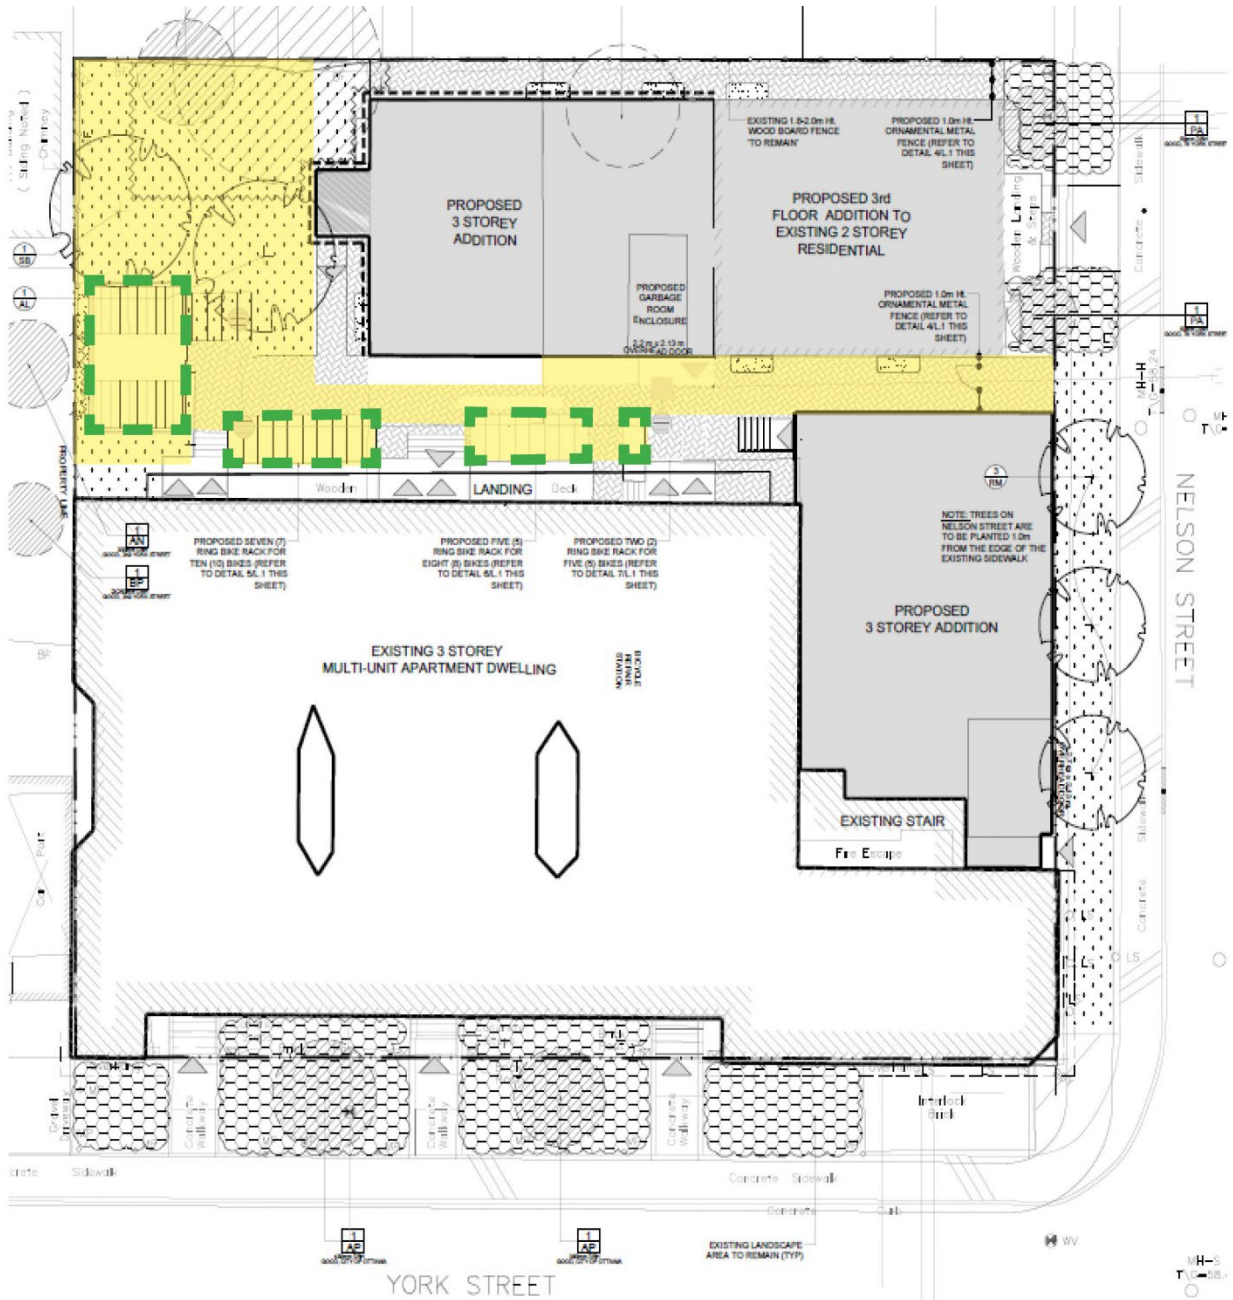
Proposed easement / Right of Way (yellow) shown on the site plan. Bicycle parking outlined in green dashed lines.
